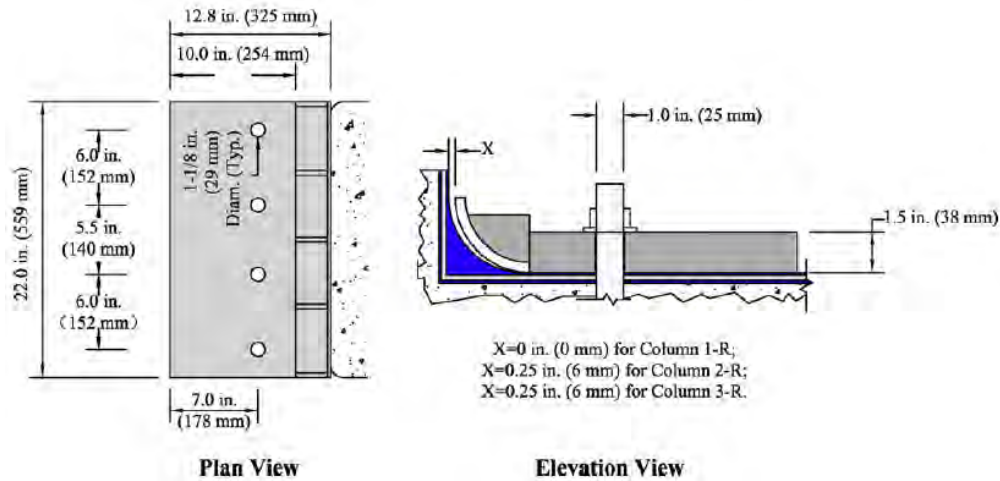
Anchor for the north and south longitudinal CFRP (He, 2013)
